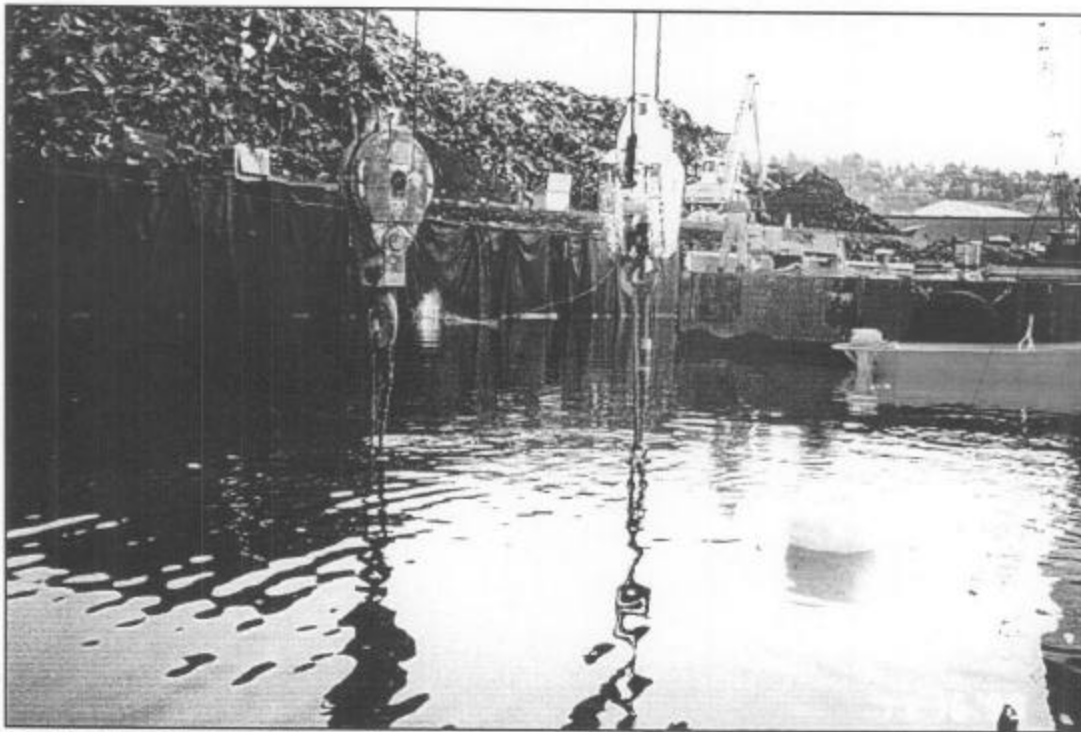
Placing Riprap for Toe Berm by Submerging Skip Box
